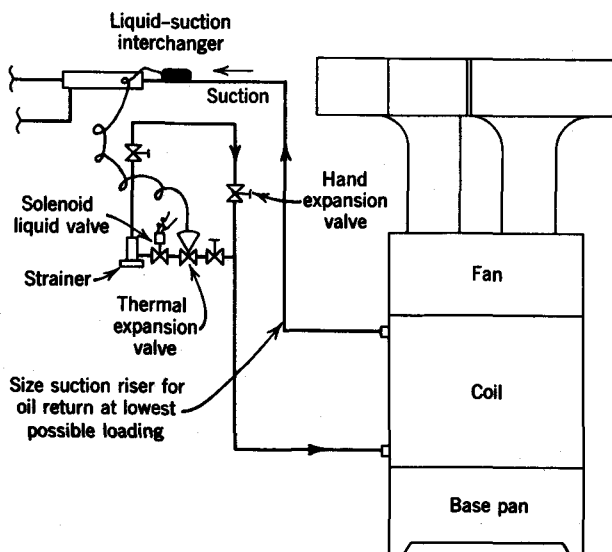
Forced circulation air cooler with direct expansion feed of flooded-type coil. (Courtesy Carrier Corporation.)
